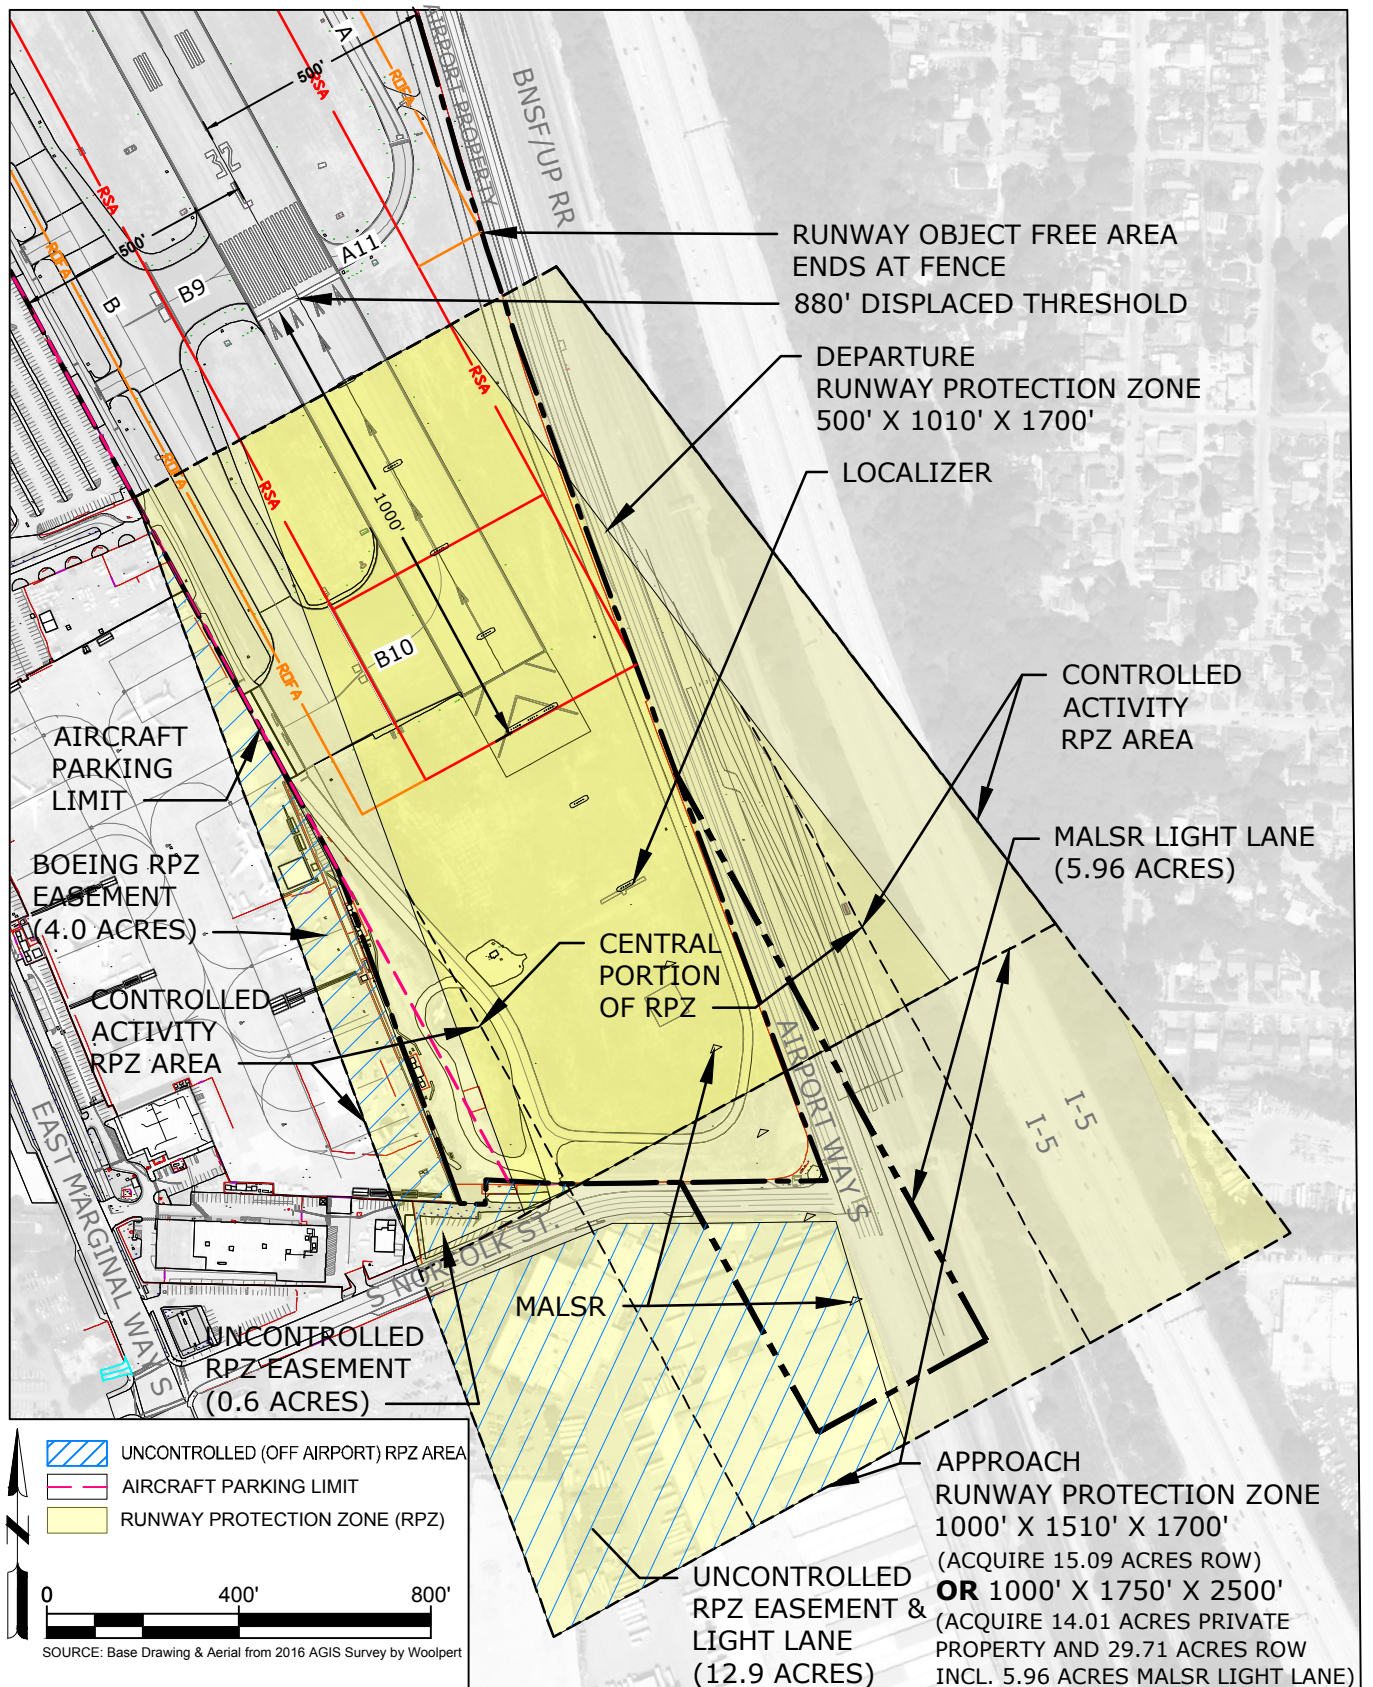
RUNWAY 32L INSTRUMENT APPROACH PROCEDURE/ RUNWAY PROTECTION ZONE DETAIL - ALTERNATIVE TWO
